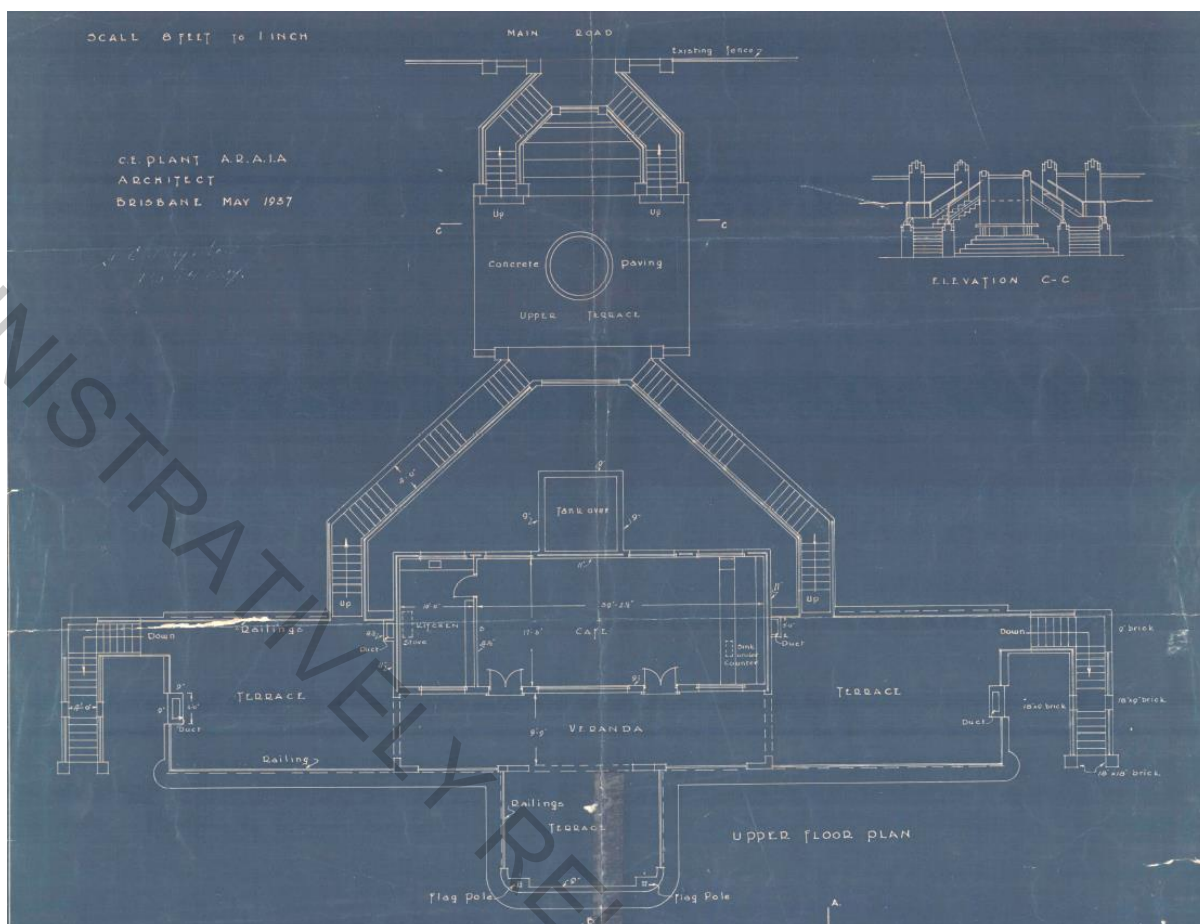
Upper floor plan – including stairs to Marine Parade, 1937 (MBRC Library).
